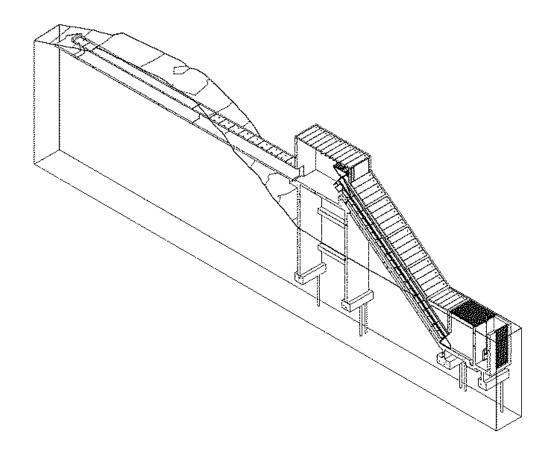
Isometric View of De Put Abstraction Screw Pump Station and Outlet Channel Through Dam
